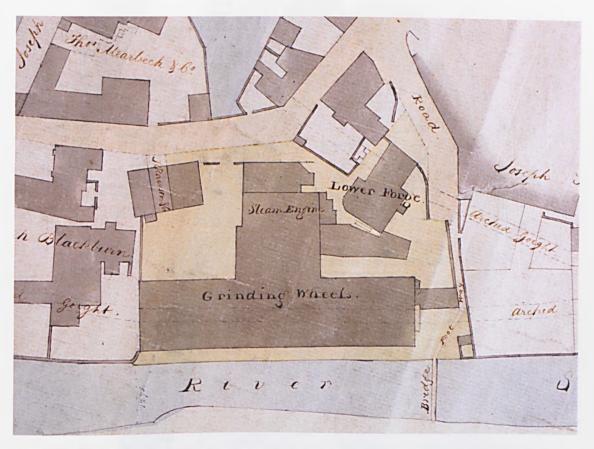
Detail of the above plan, with the early layout of engine, wheel building and the adjacent water-powered 'Lower Forge'. The footbridge was rebuilt to accommodate the new grinding wheel, see fig. 4.17. Not to scale (SCA).
